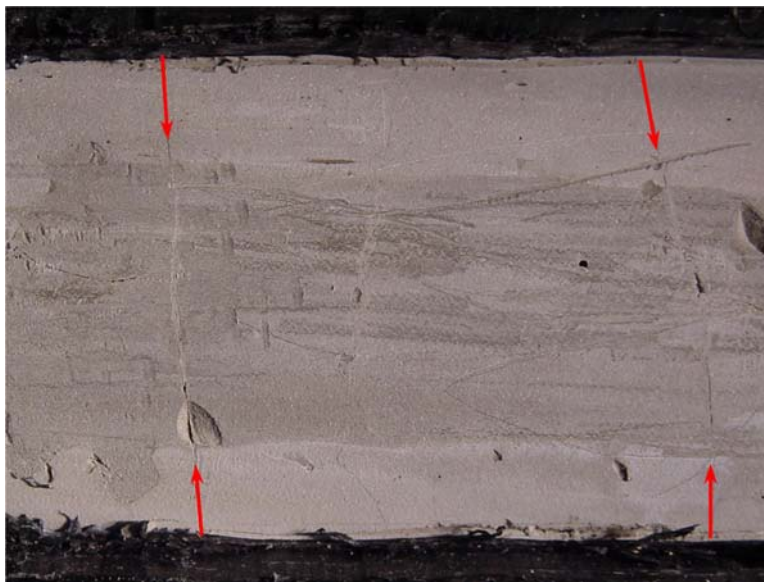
Condition of Grout at Deck End Immediately after Removing PE Pipe – Specimen 10
